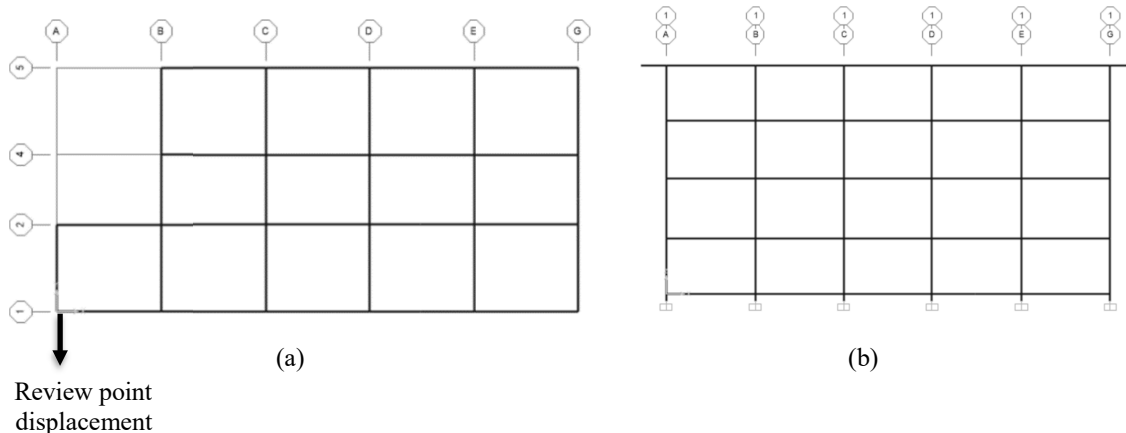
Views and Building Plan On Moment Resisting Frame System (MRF)
